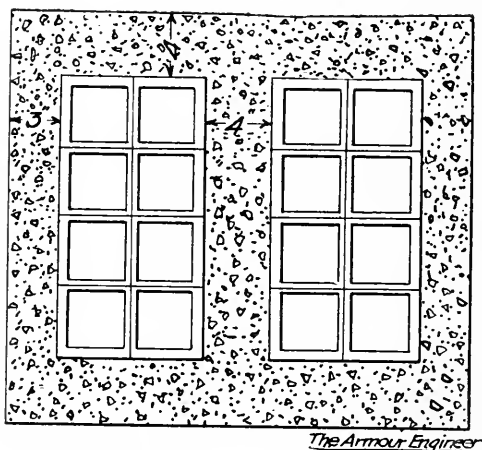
SEPARATION OF RUNS BY CONCRETE BARRIER.
